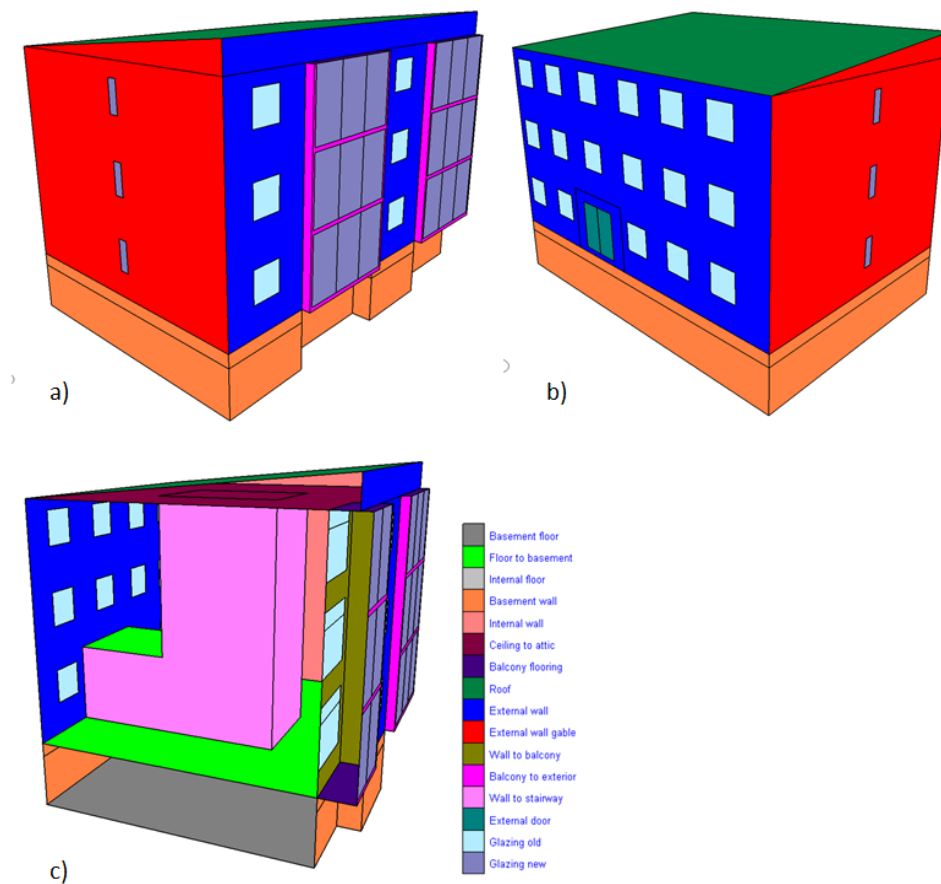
Model type B of Magisterparken demonstration building – whole staircase as thermal zone, a) South facade, b) North facade, c) Vertical section view through the model.
